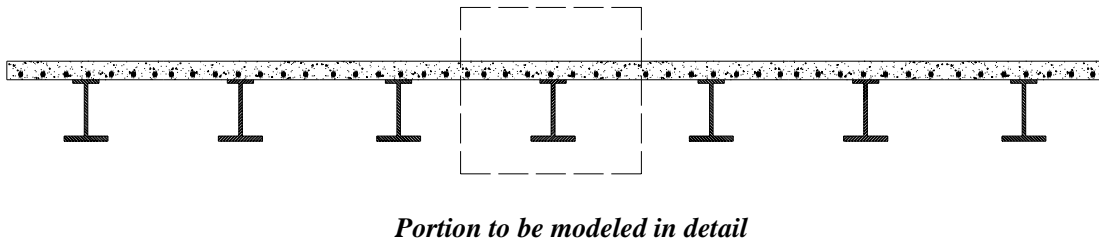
Cross-section of typical slab-on-girder bridge superstructure.
